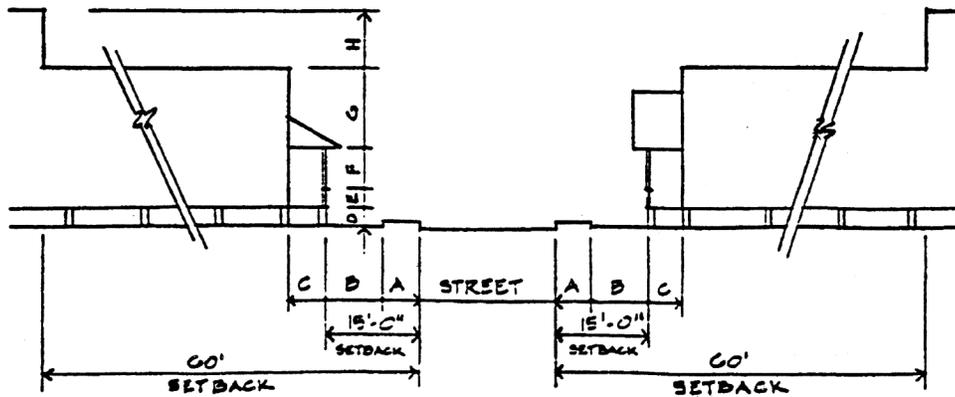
WOOD COTTAGES DISTRICT—Streetscape, Type 1
